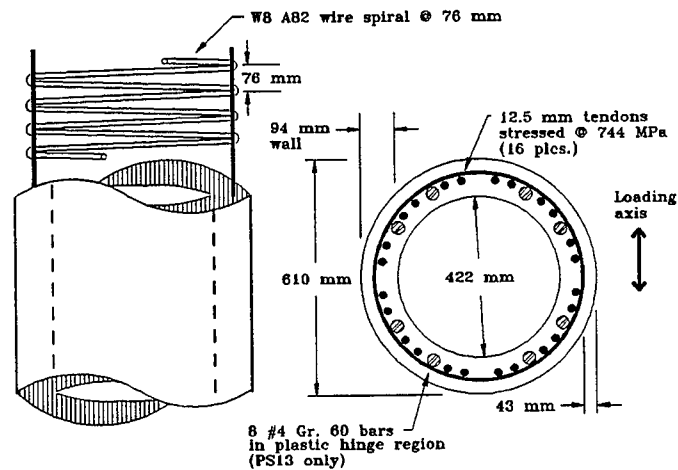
Dimensional and reinforcement details of pile shaft test units PS12 and PS13
